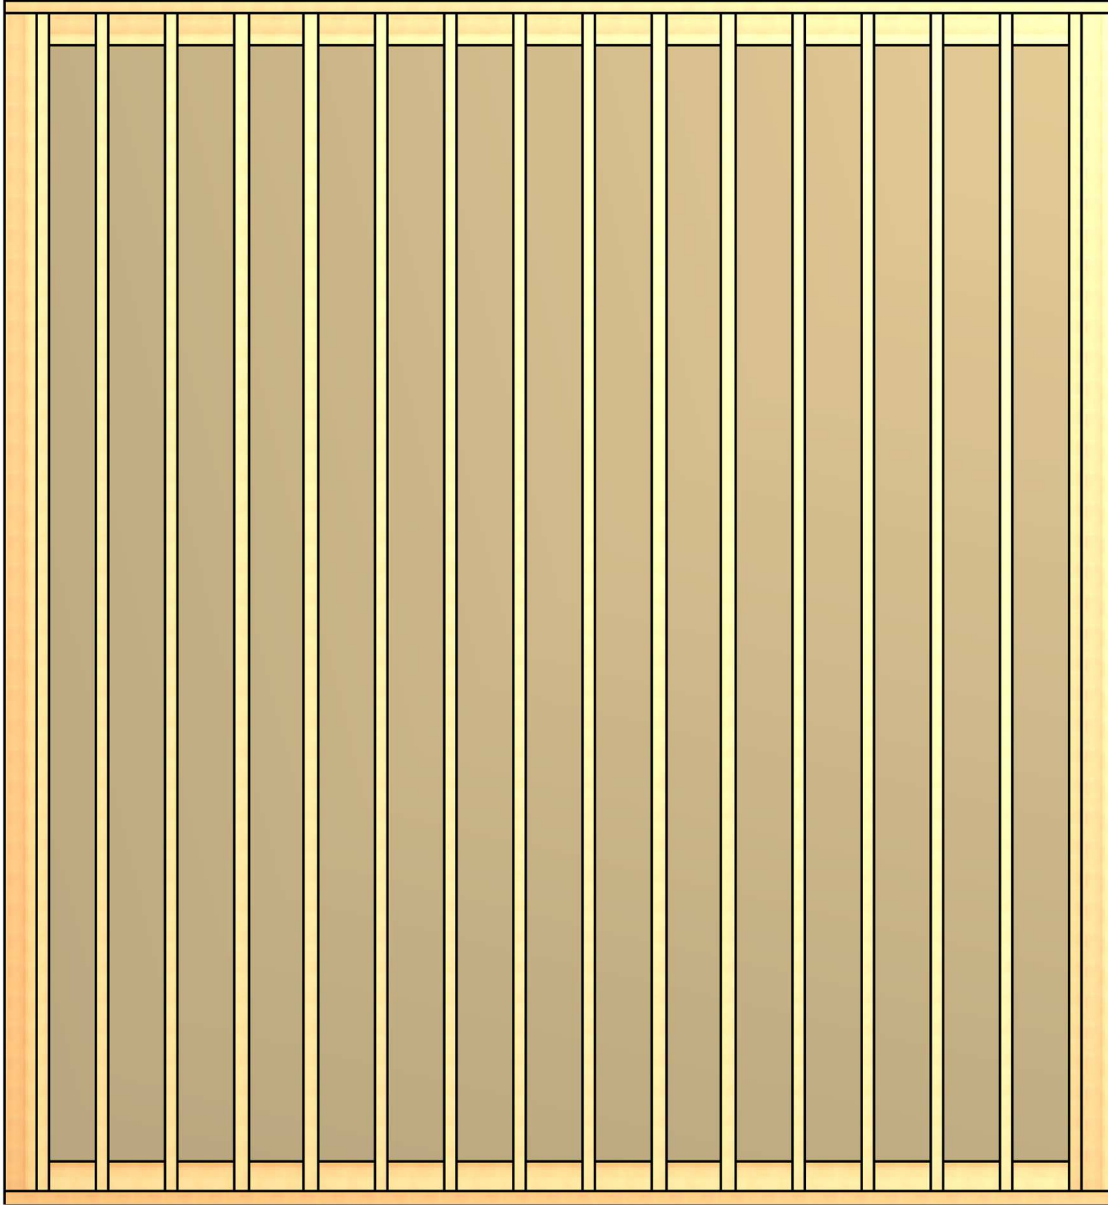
Roof - outside structure. The 8 in support spacing allows for more load in the facility.
